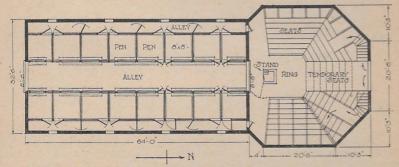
Floor plan of hog house No. 10.72-50, shown in figure 9. A sales pavilion is shown at north end.
